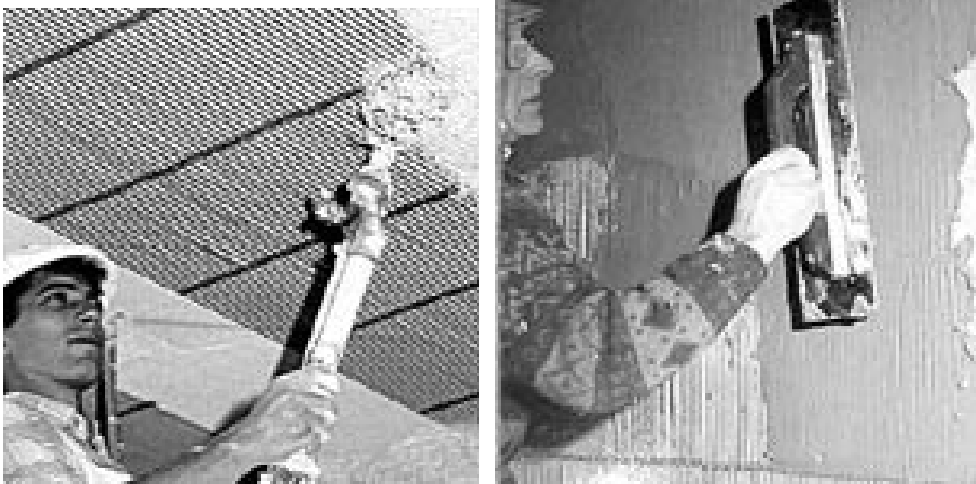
Embedding the capillary tube cooling mates into the ceiling or the walls²⁶
